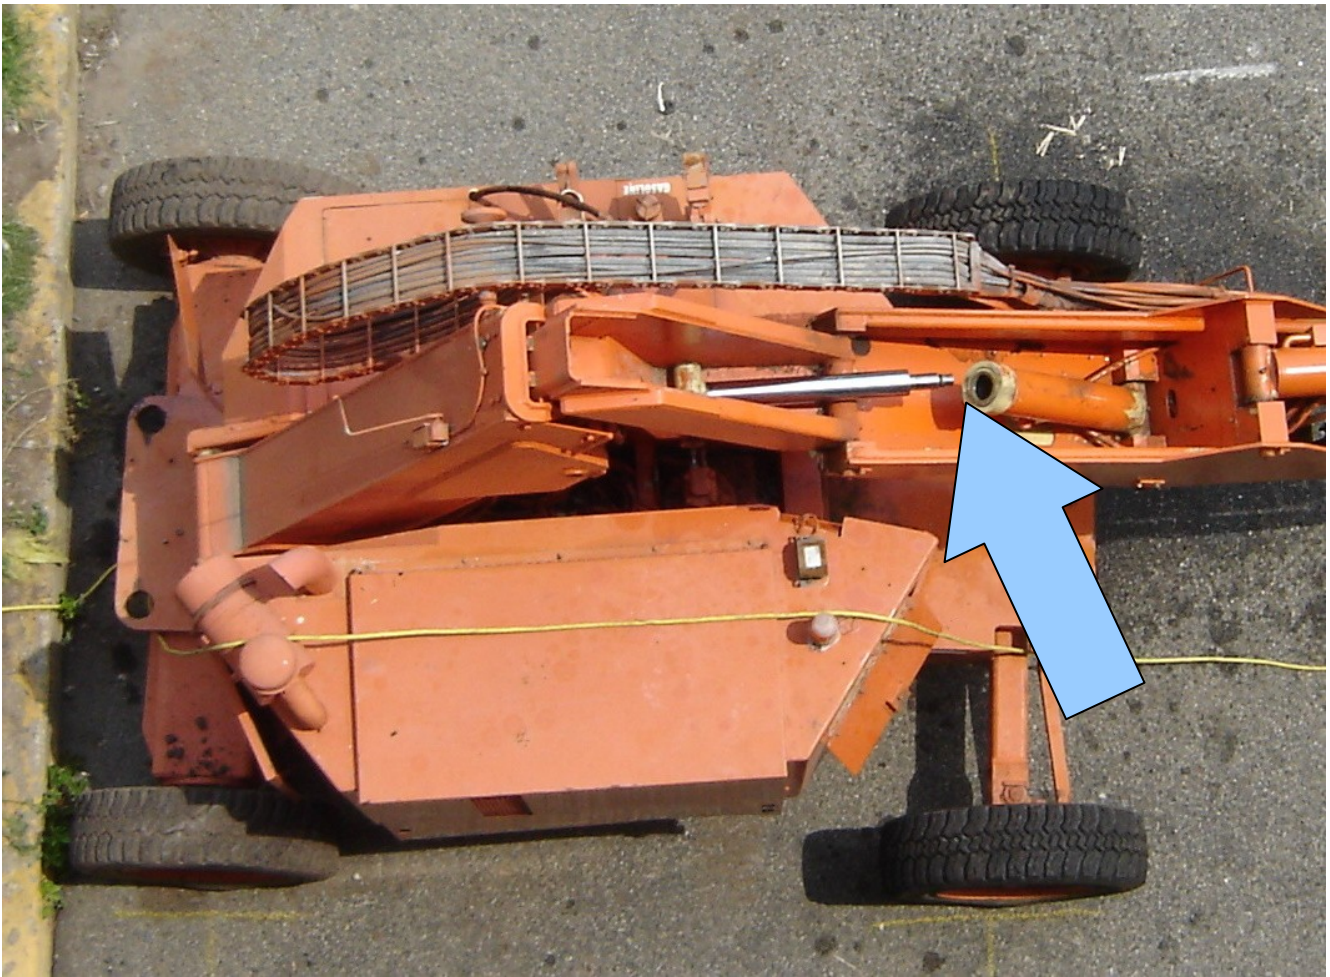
Top view of the collapsed aerial work platform with the rod completely separated from the upright level cylinder (Photo courtesy of OSHA)
